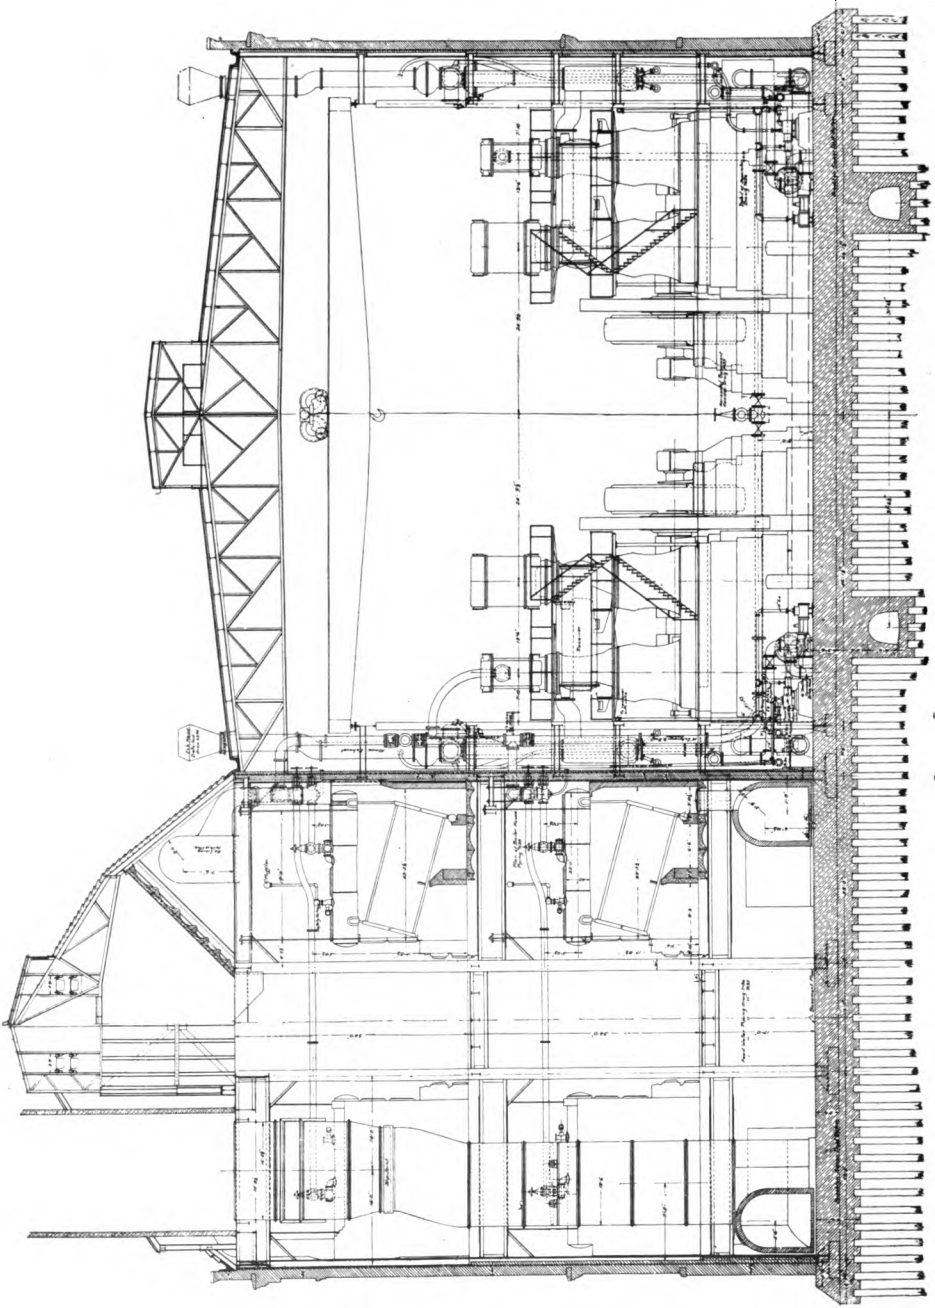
Cross Section, Central Power Station, B. R. T.
